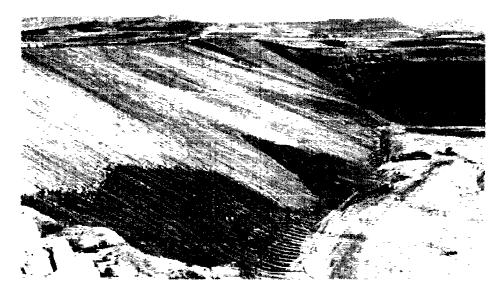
Final soil cover being placed on SP-WS-17 (looking NE).
